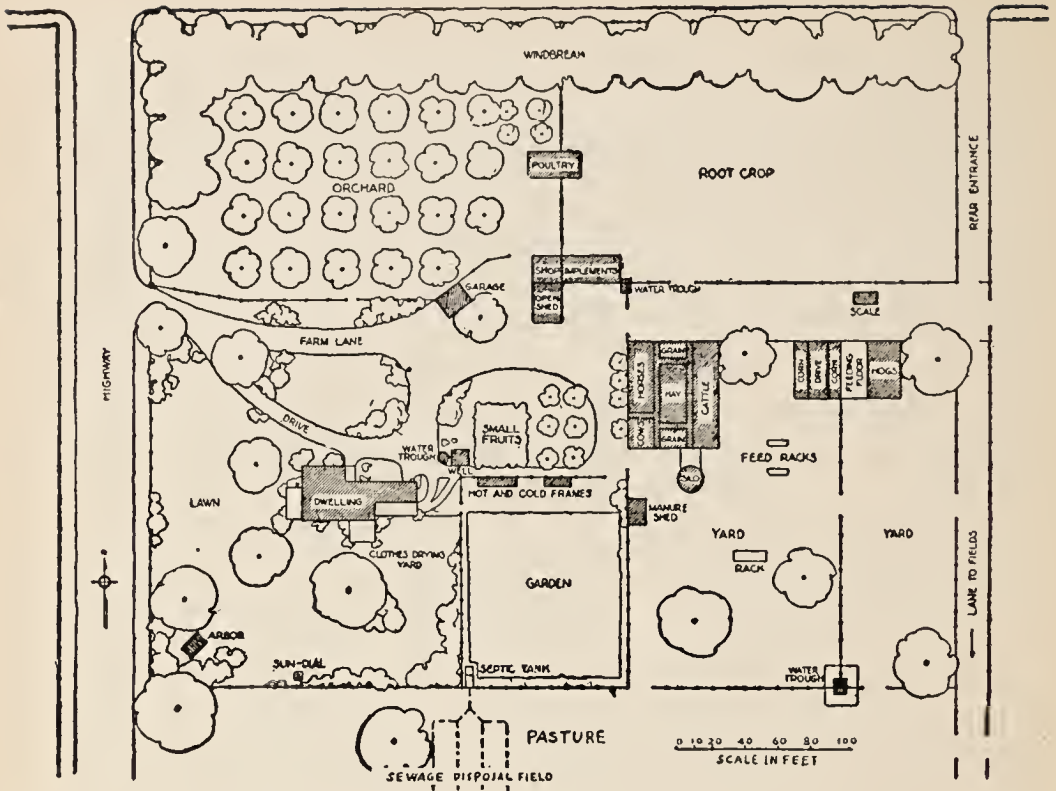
This shows details of a well developed farmstead on a Corn Belt farm. A windbreak protects the buildings from north winds. House is near the highway. Farm buildings set well back from the road are near the lane to the fields, and they are reached without going through the door yard. (U.S.D.A.)
